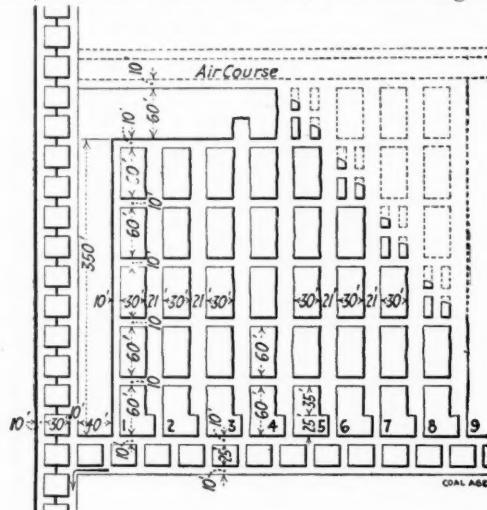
RETREATING PLAN OF DRAWING PILLARS AND BARRIER
